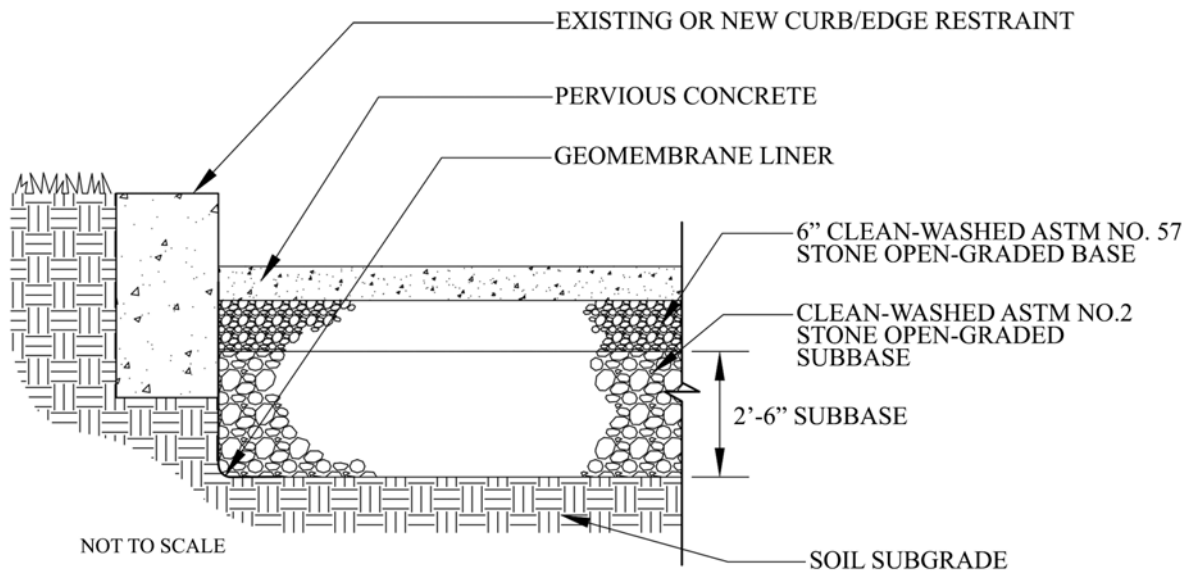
Pervious Concrete Section Detail, *image by Author.
